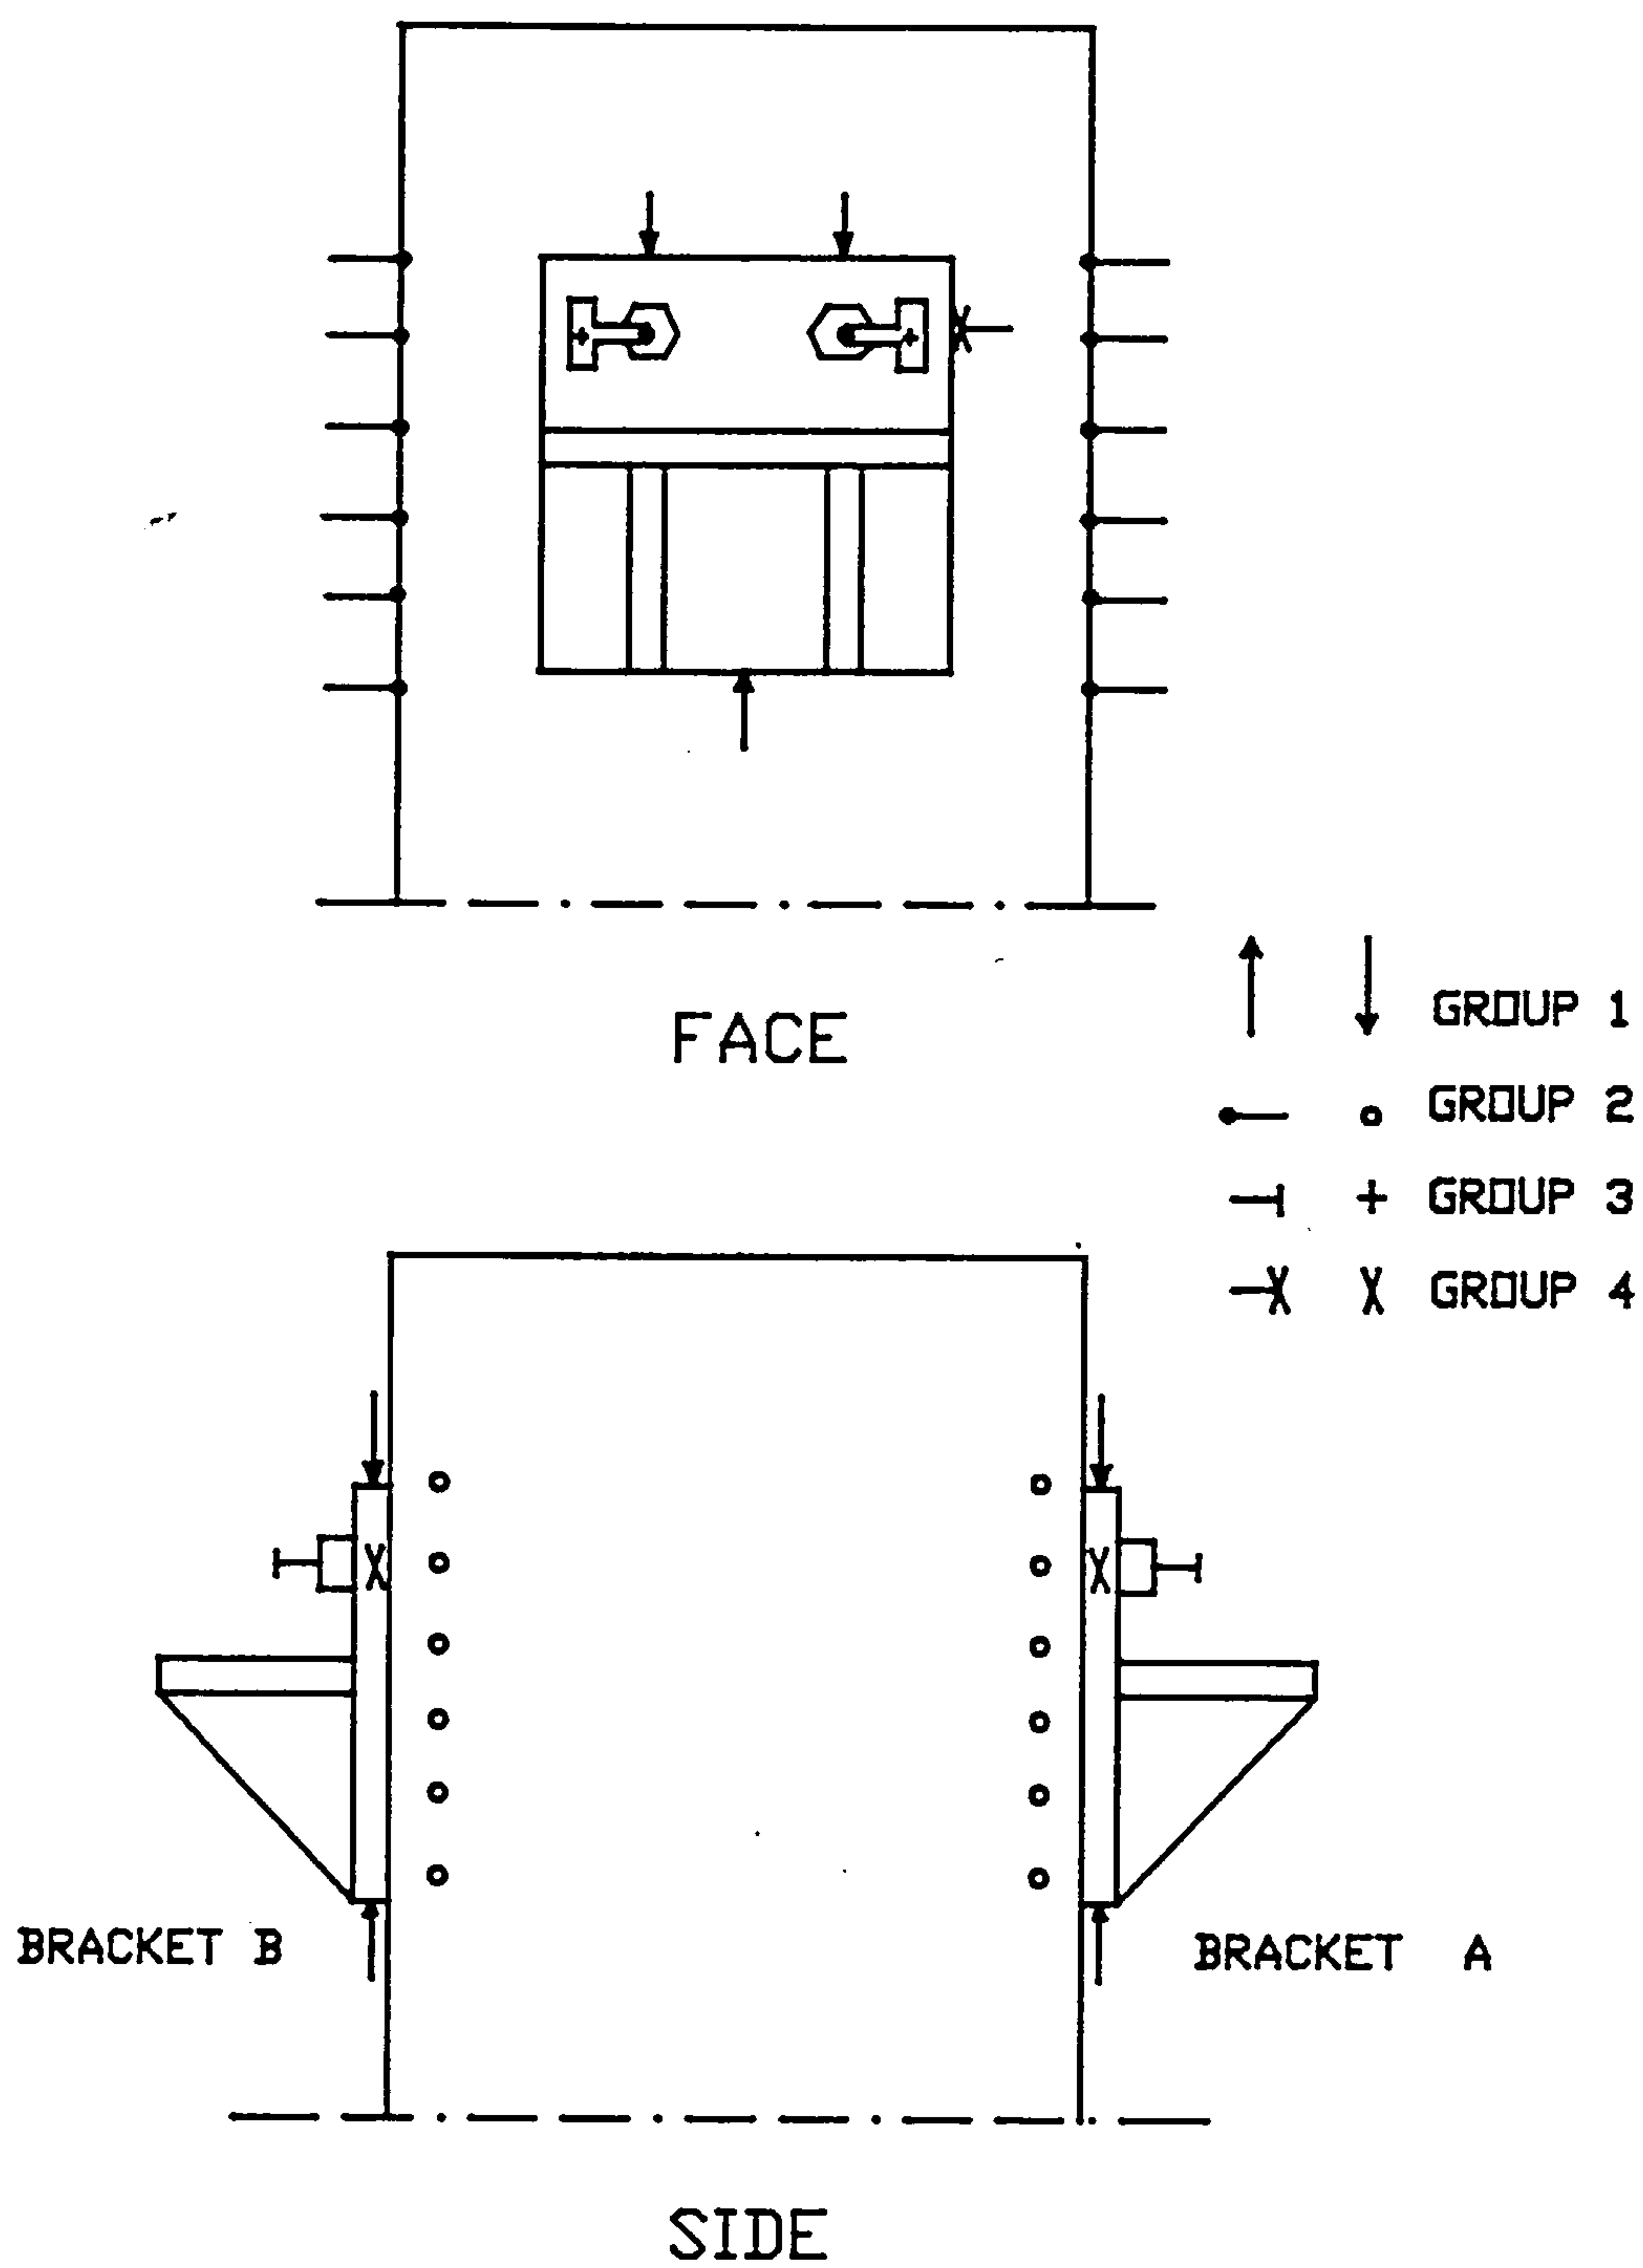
A TYPICAL ARRANGEMENT OF TRANSDUCERS AROUND A TESTED JOINT.
